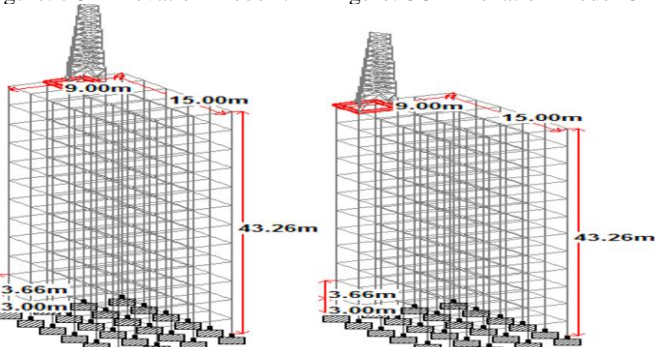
3D Elevation Model-9 Figure: 10 3D Elevation Model-10
